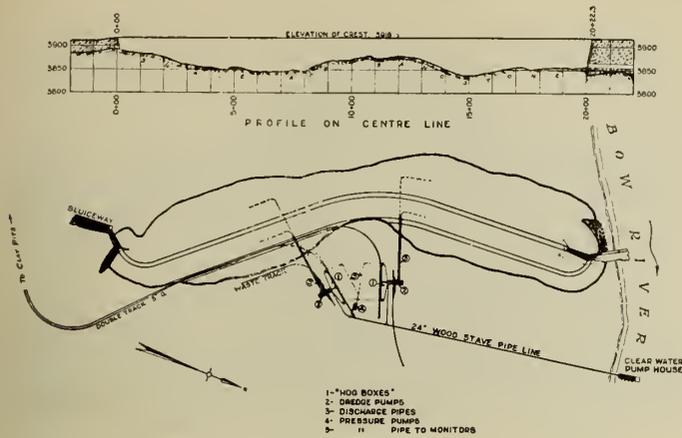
South Earth Fill and Hydraulic Plant.
